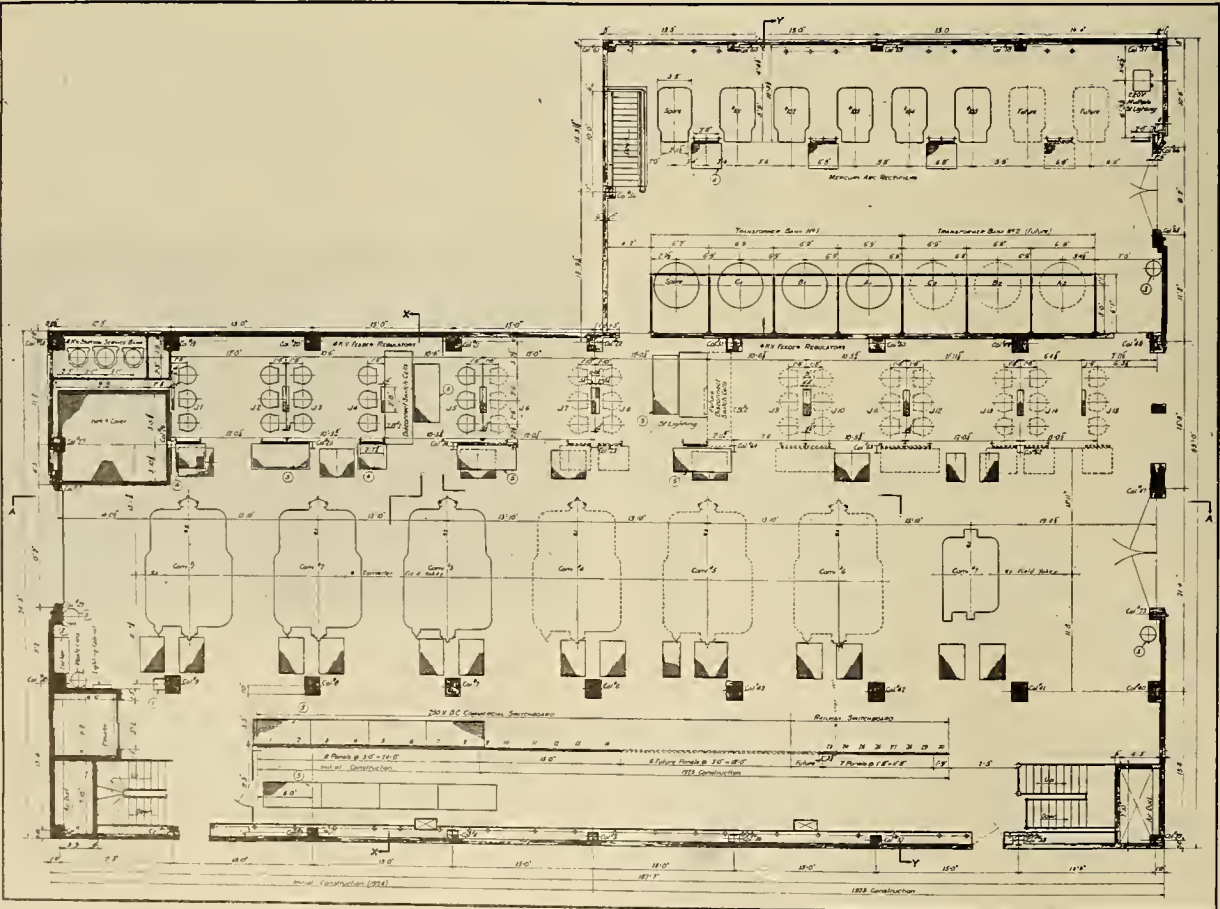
Plan of first floor showing general arrangement of equipment, station J.
